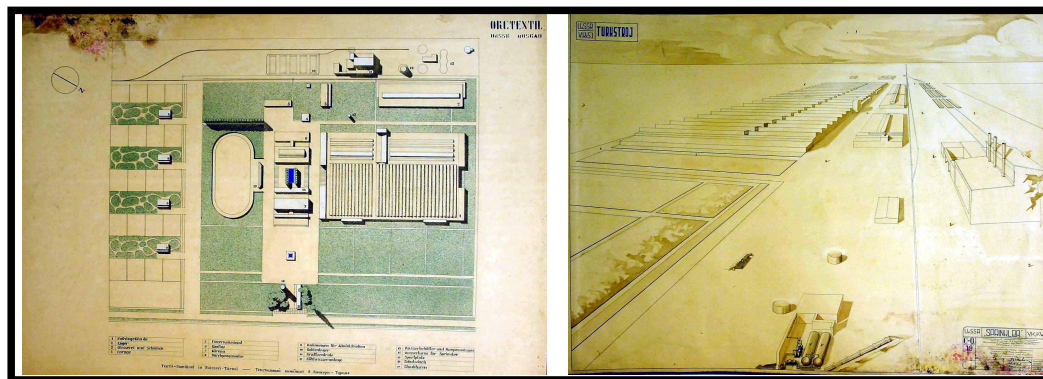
Site plans which were drawn by Russian architects(1935)⁴⁰
